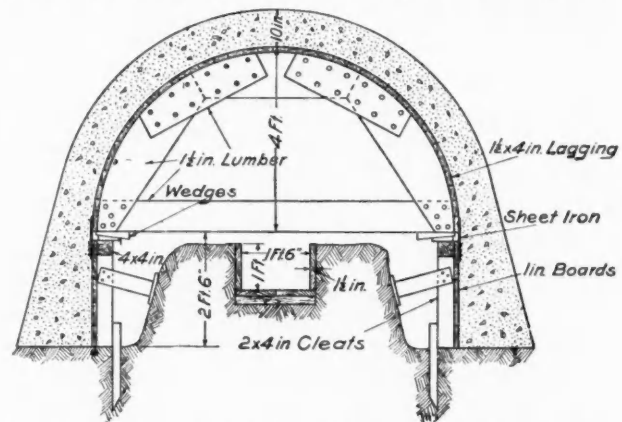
Forms for Arch Culvert, Showing Use of Drainage Flume
